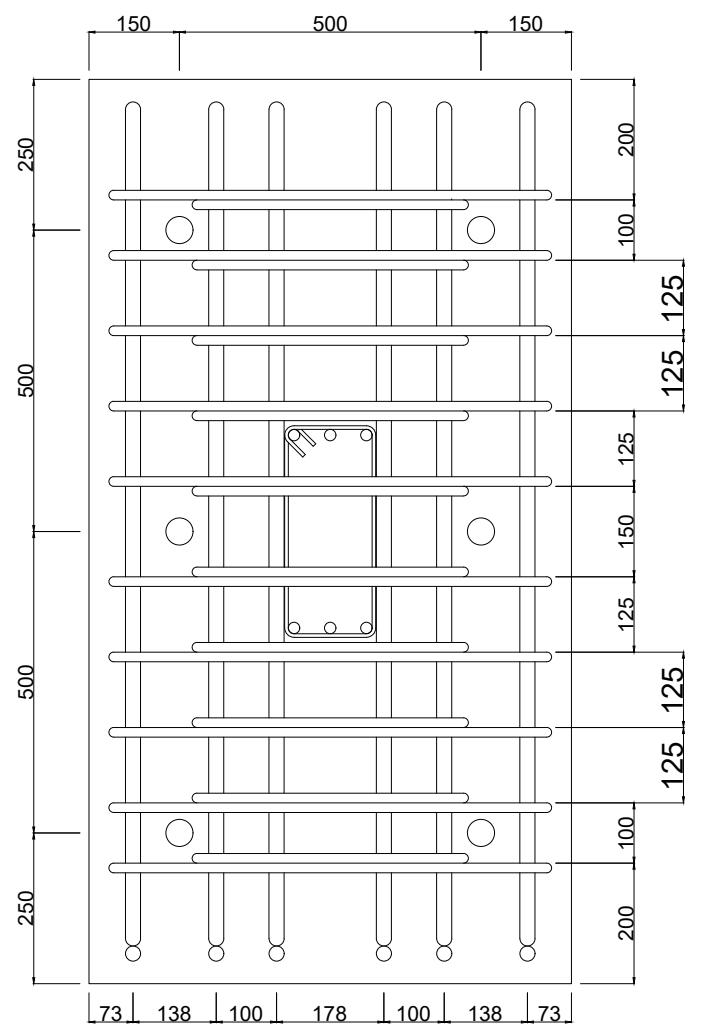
Dimensions and reinforcement details of SP-S6-AR
